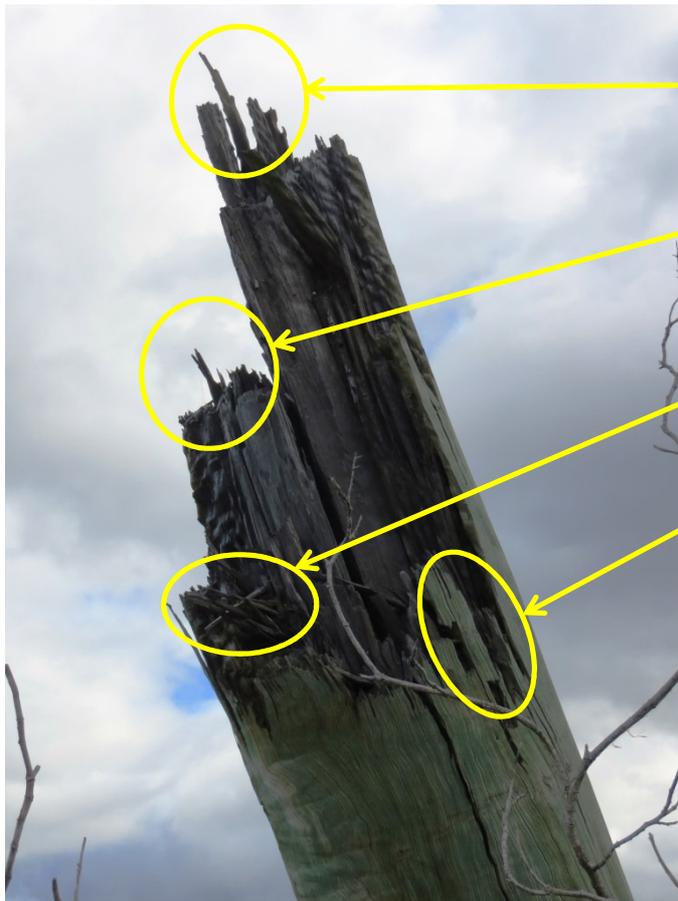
Close up of bruising damaged middle section of pole and typical shelling
